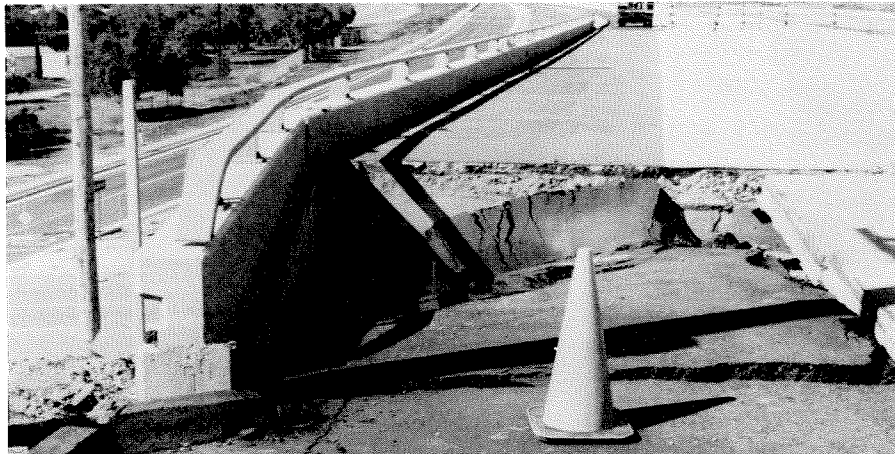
Eastern abutment of the southern bridge of the Roxford Street undercrossing, Foothill freeway.
